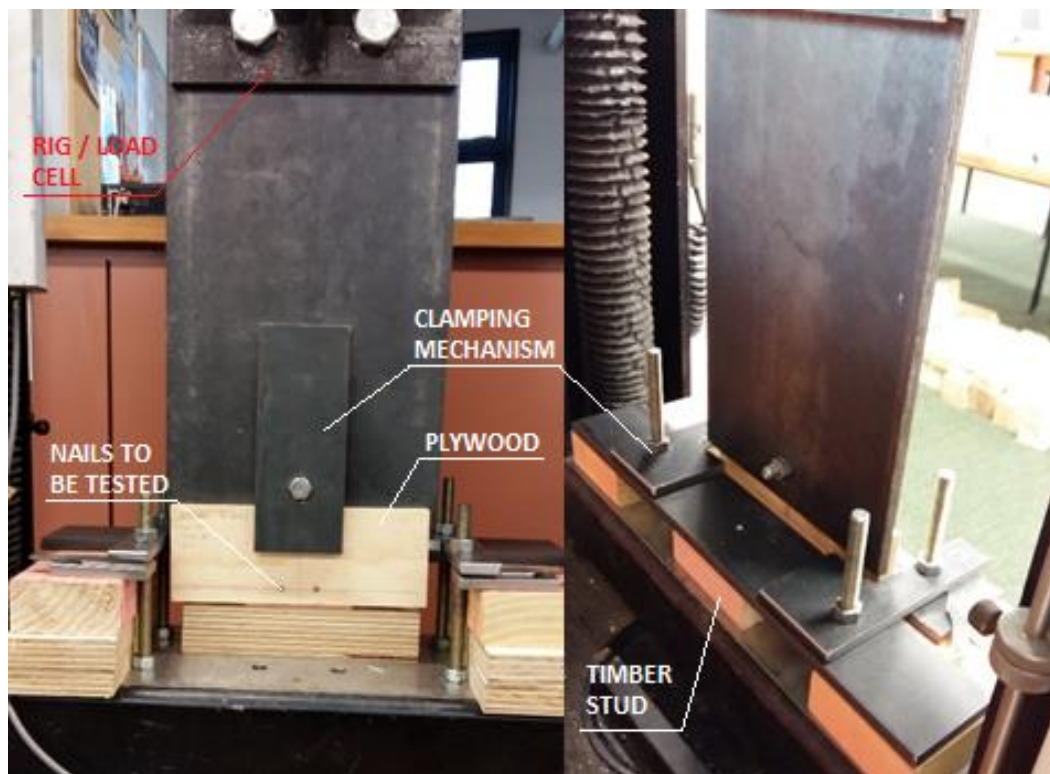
Timber-plywood connection test setup. Front and Rear view.
